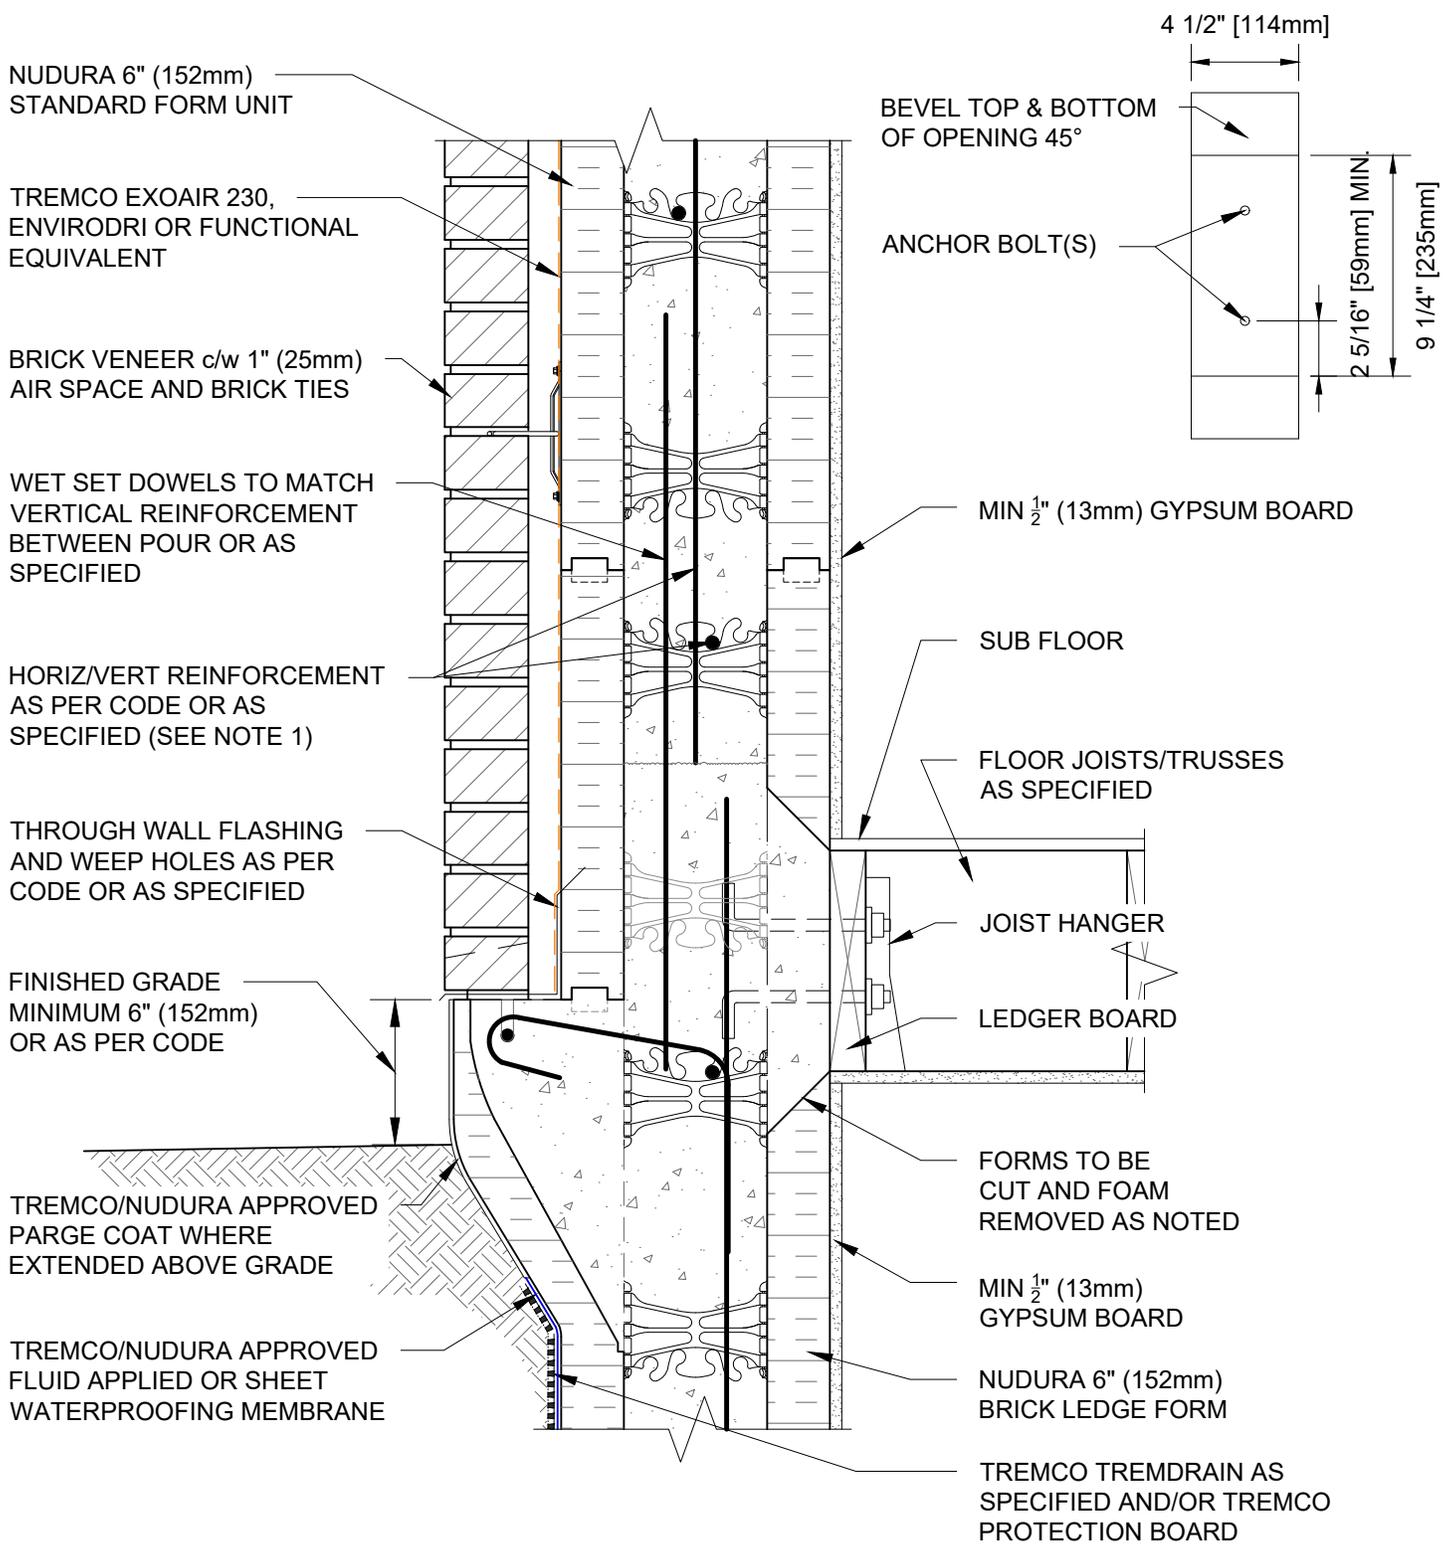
" (152mm) Form Unit, Ledger Board Connection, Brick Veneer Finish
